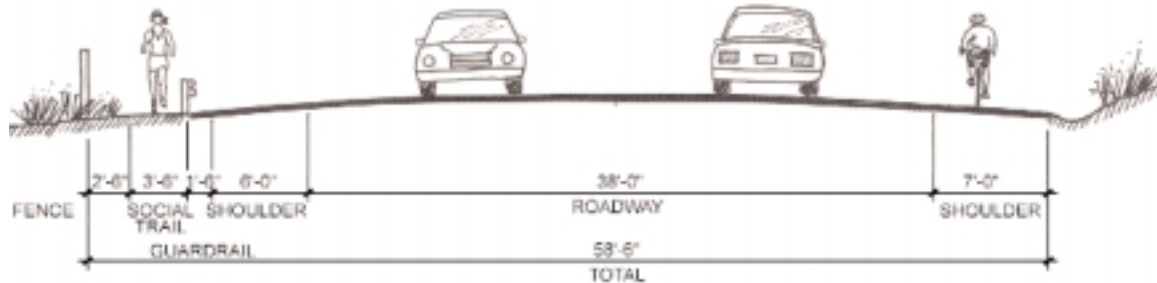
Existing Conditions at Lincoln Boulevard at Kobbe Avenue
